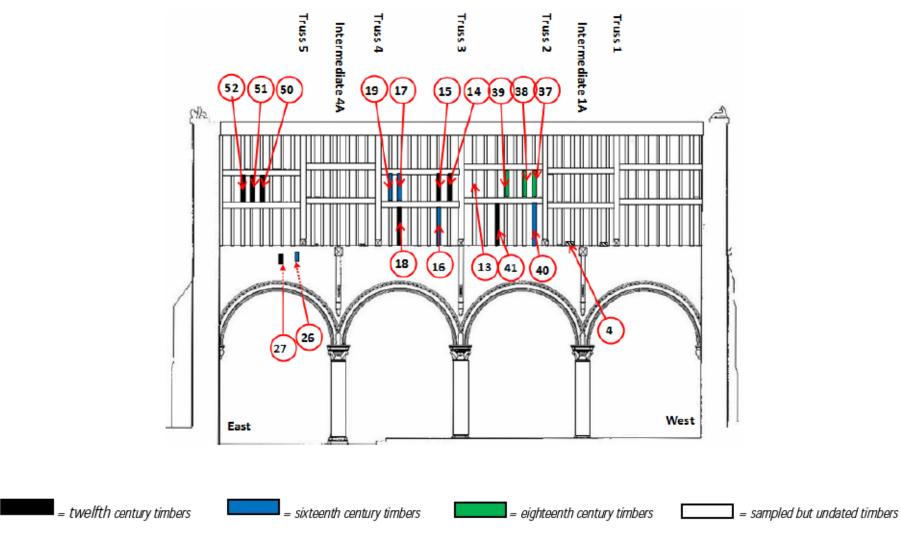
Long-section looking south to show sampled timbers (after Nick Hill)
